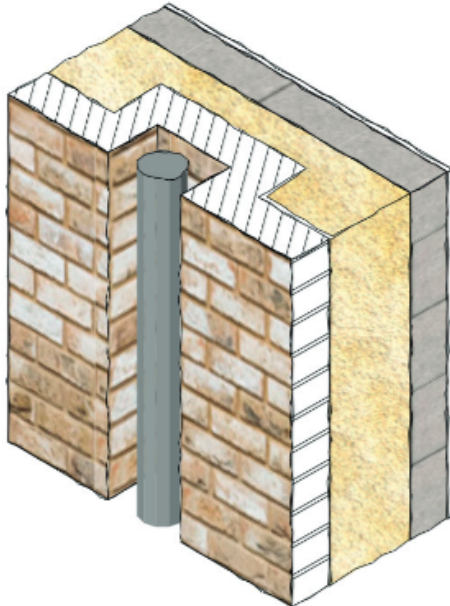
; Diagram showing design intent of gutter detail on Stile Road front bay projection.
